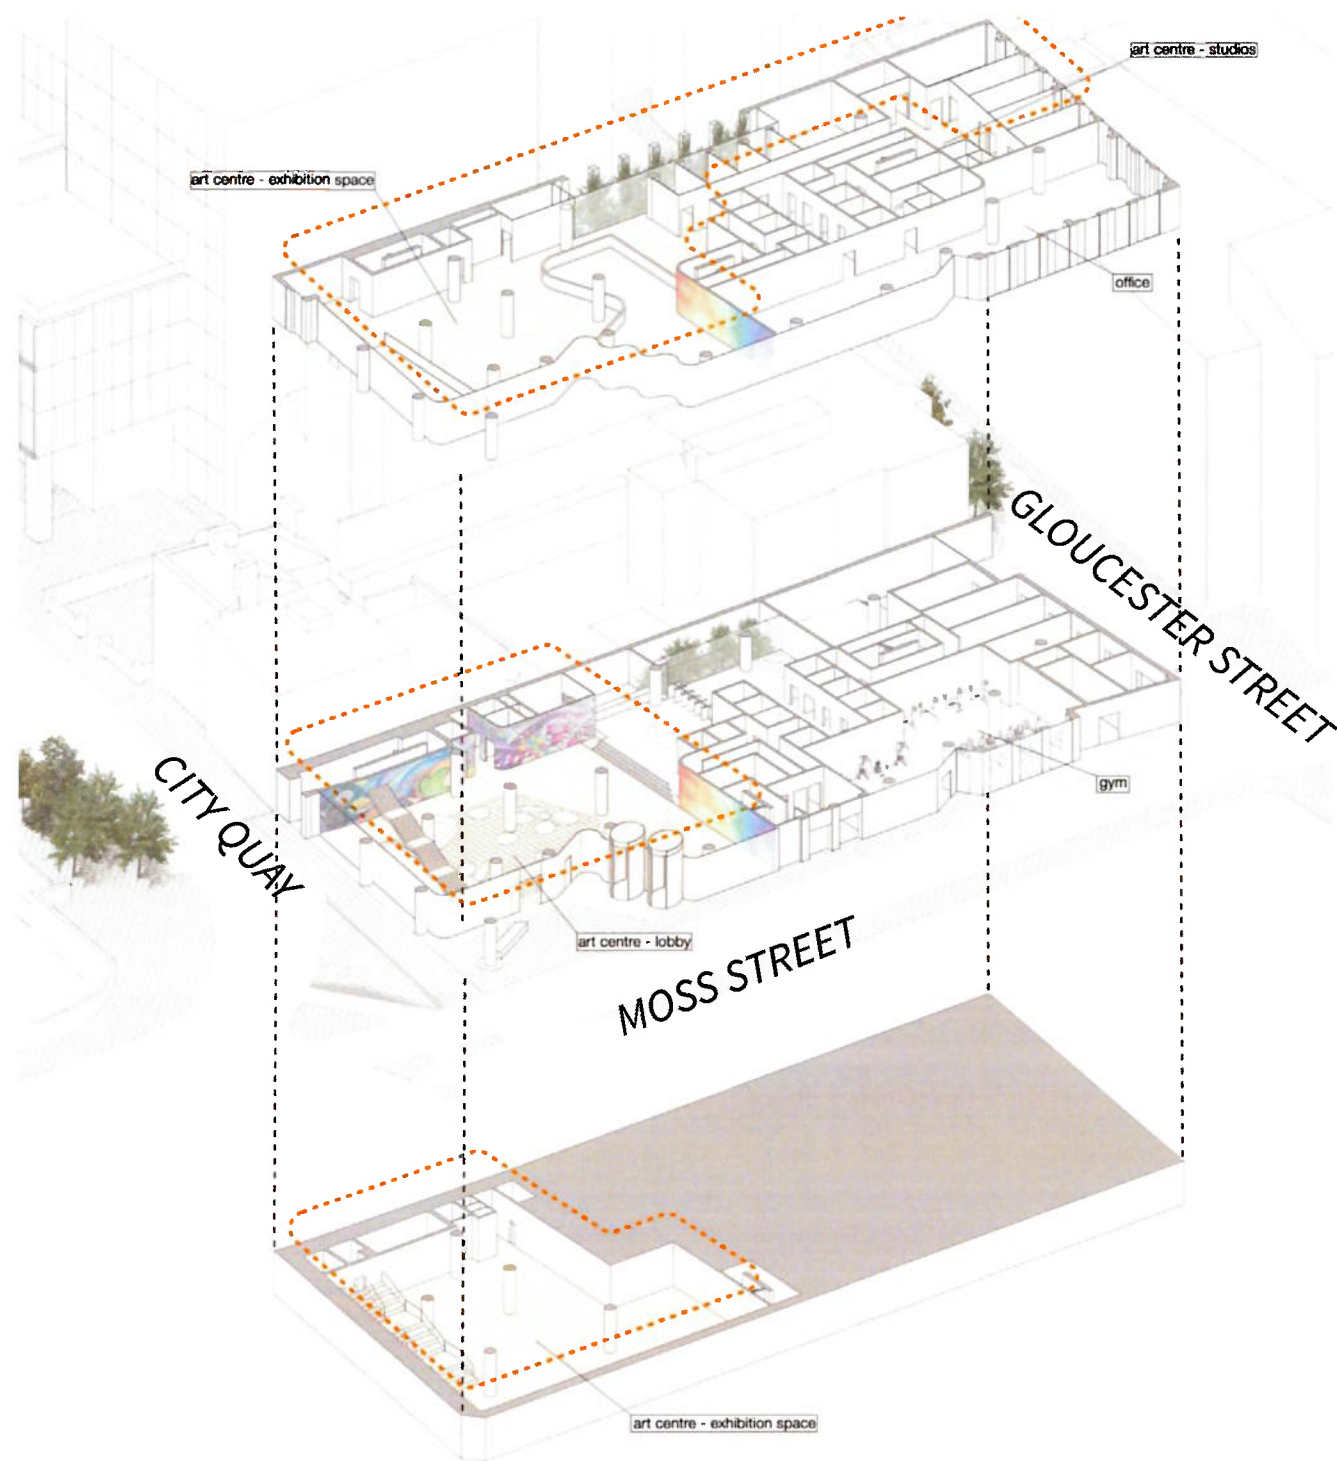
Art centre at the ground floor, lower ground floor and first floor
